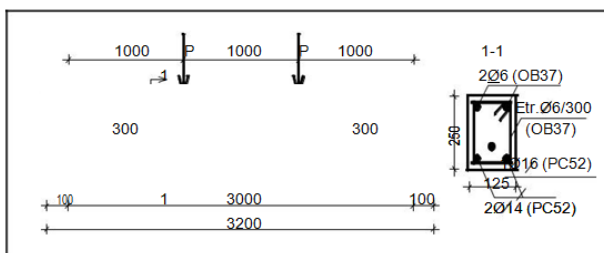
Longitudinal and cross section – reinforcing and loading manner
